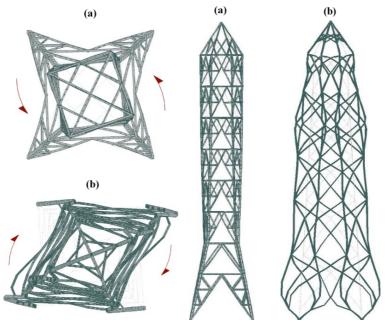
Torsional mode on plan and elevation (a) specimen UA and (b) specimen OT.
